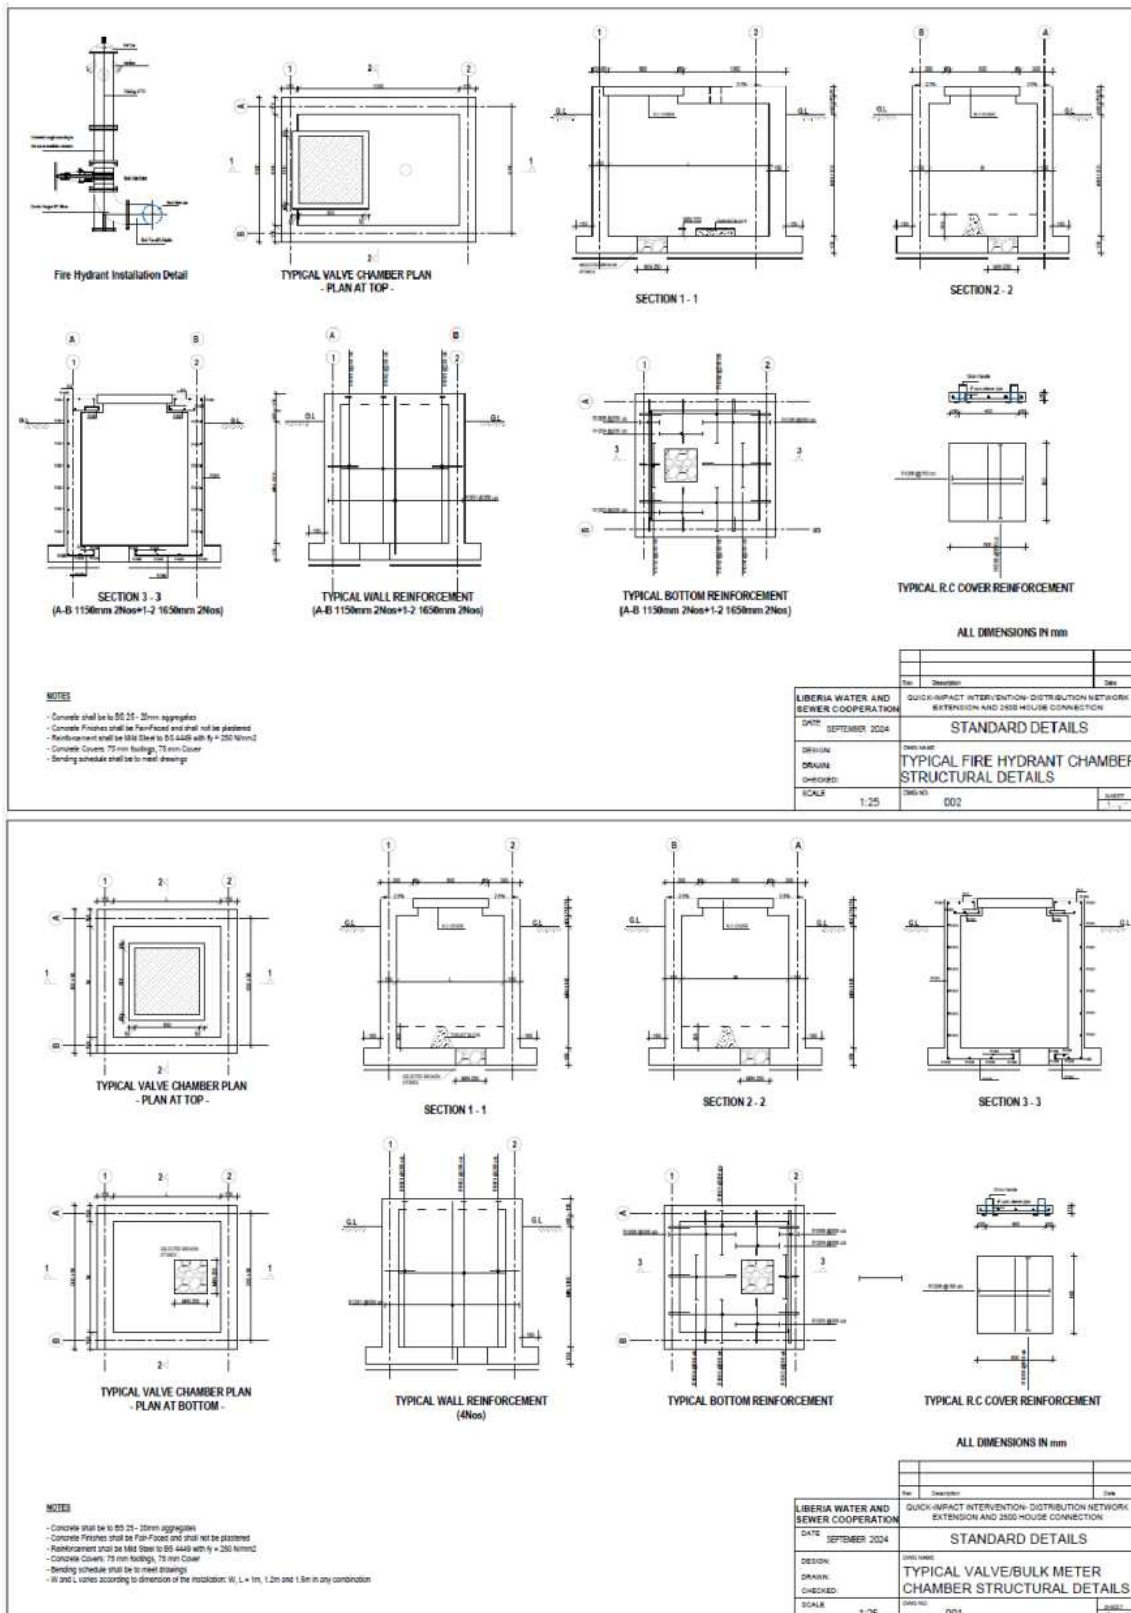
Sectional detailed designs for Typical Fire Hydrant Chamber & Valve/Bulk meter
